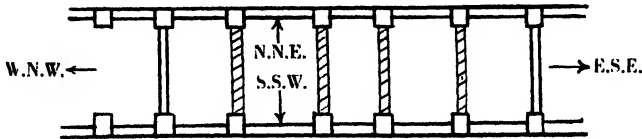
Plan showing arrangement and aspect of walls, piers and beams in a typical “box” near E.
